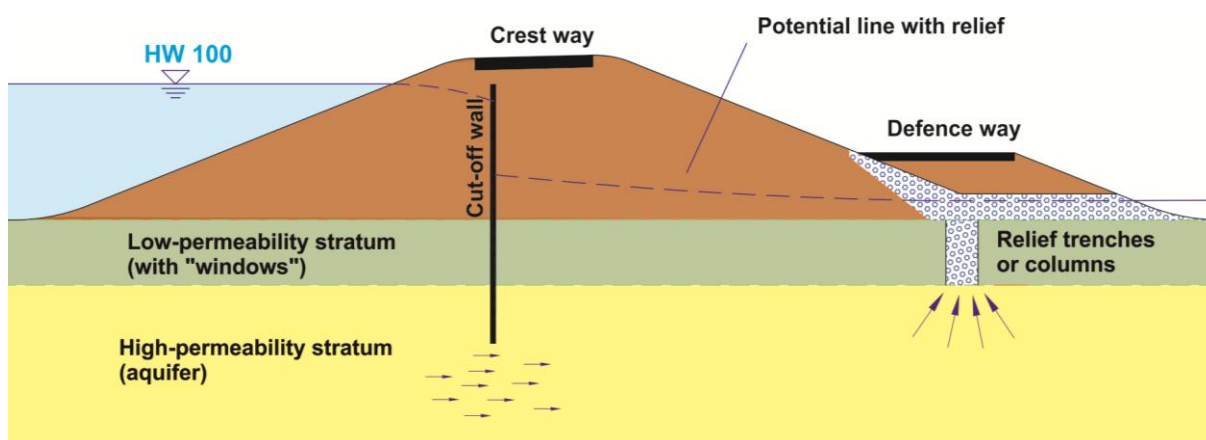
Standard cross-section of a new 75 km long flood protection dam in Austria. Widely reuse of old fill material from removed dykes. Cut-off wall works also as a barrier against beavers.
